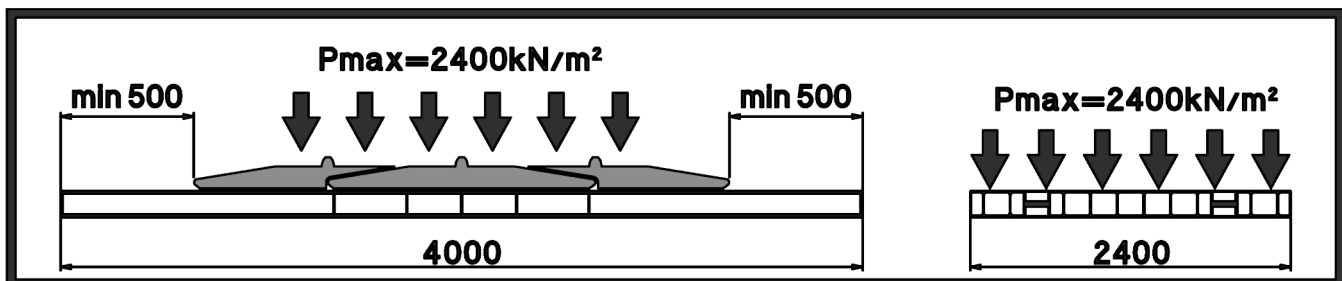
Driving the outrigger pad in the cross direction with a crawler crane
